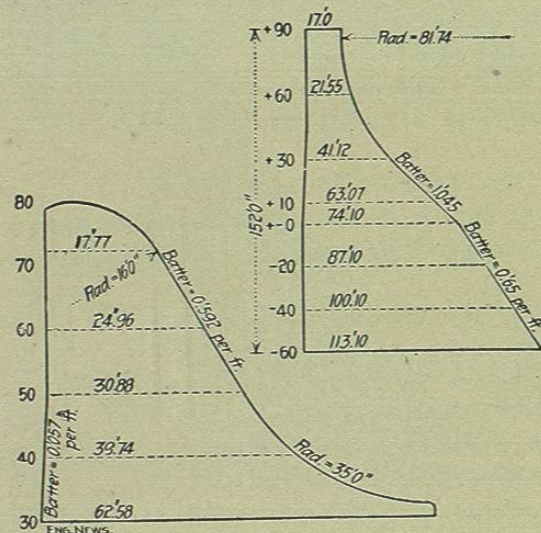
SPIER FALLS DAM, N. Y. PROFILES OF OVERFALL AND ABUTMENT SECTIONS.
